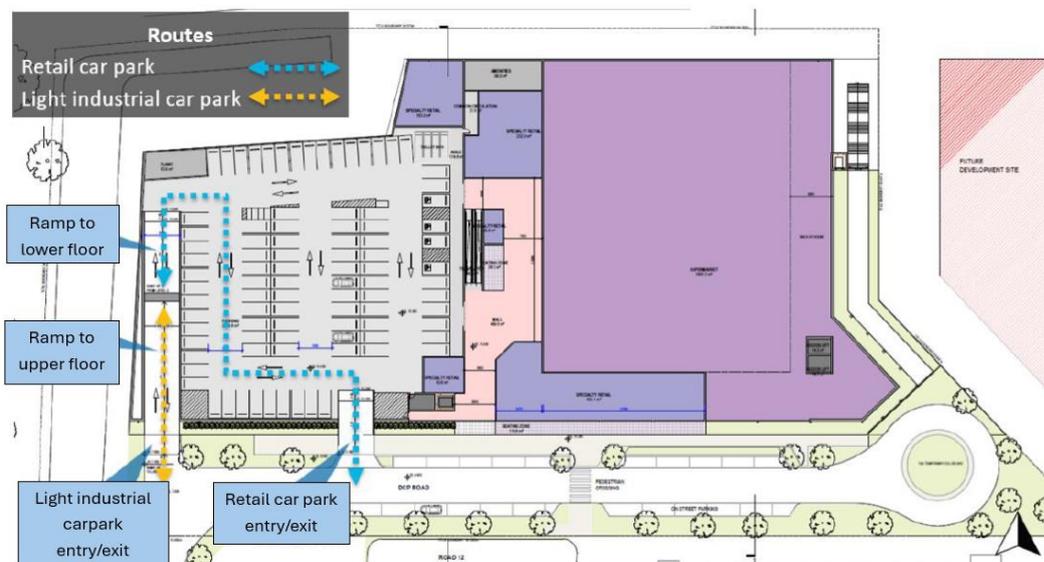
Sprinkler Avenue proposed entry/exit points. Source: Addendum Traffic Impact Assessment Report prepared by EMM Consulting
